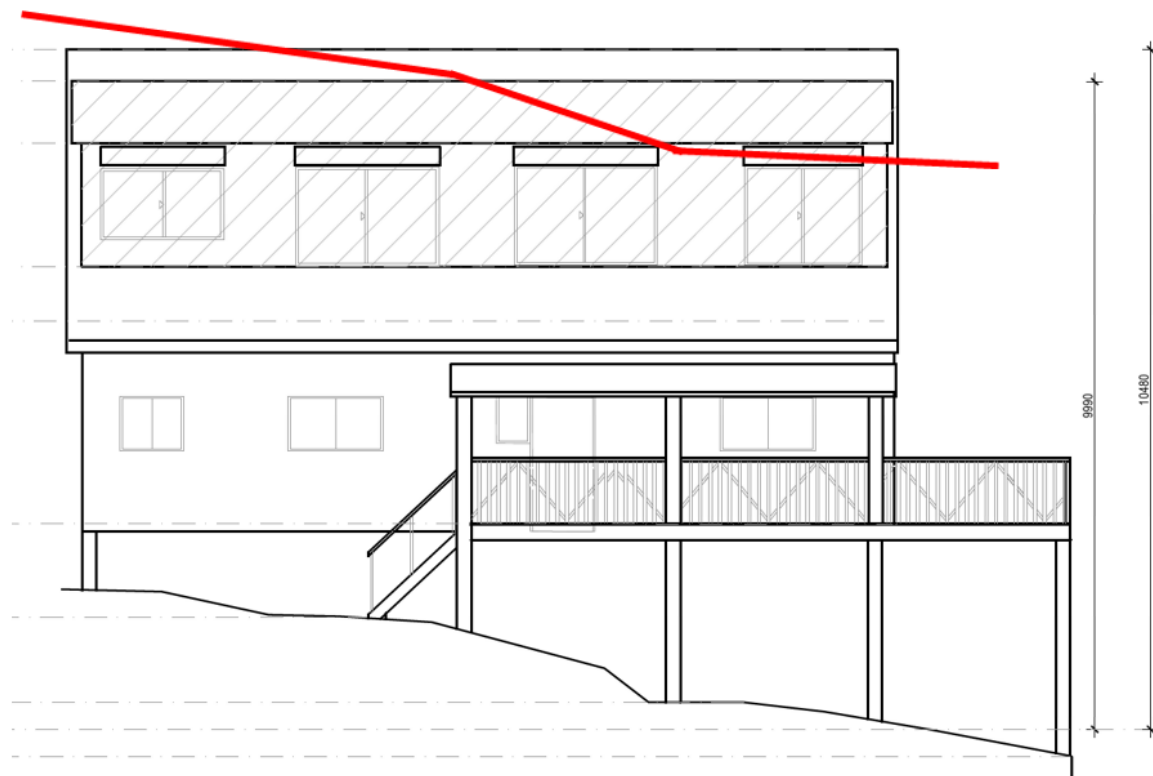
Extract of Application plans by Drafted Up showing Southern Elevation with 8.5m building height in red
